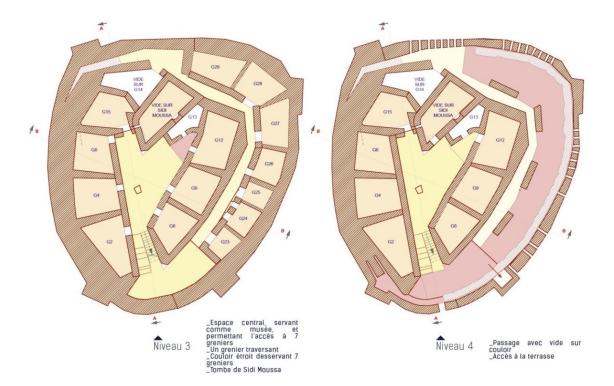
Plans of Sidi Moussa, Level 3 and Level 4
